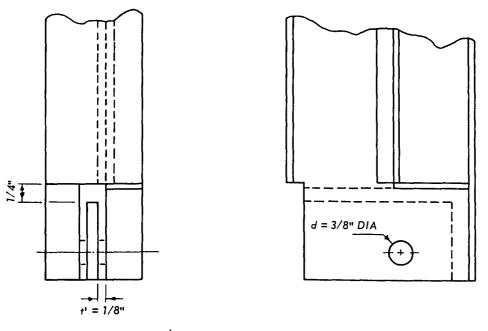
Detail of the modifications made to the structure column-truss connection.
